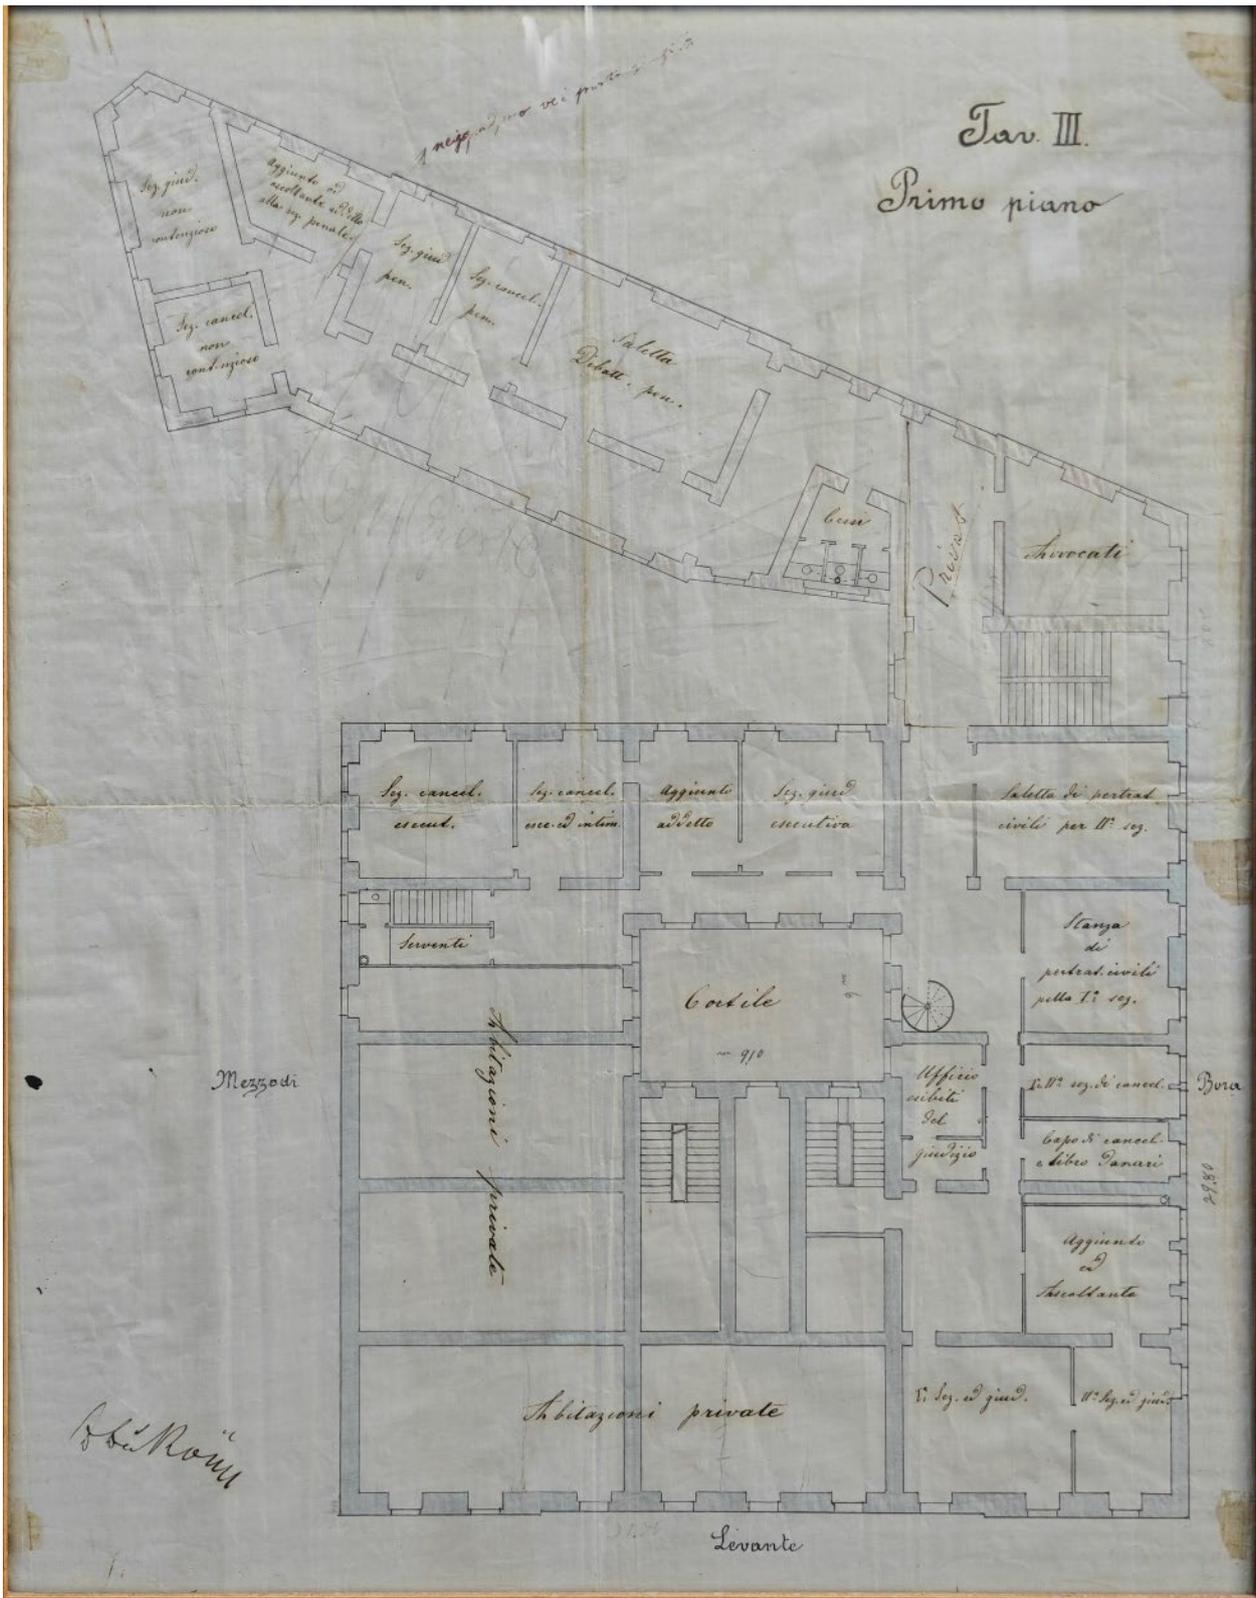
Plan of the first floor (primo piano) of Bajamonti Palace, with plans for the expansion of the new wing towards the west, which was never built.
